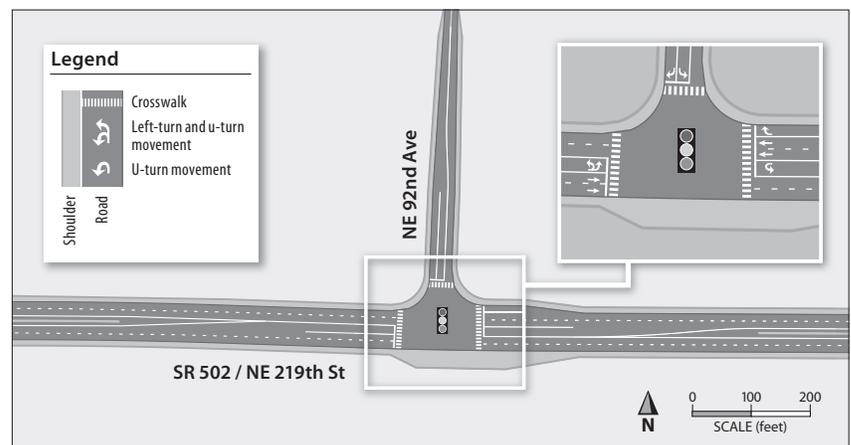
Proposed intersection of SR 502 and NE 92nd Ave under the Build Alternative
